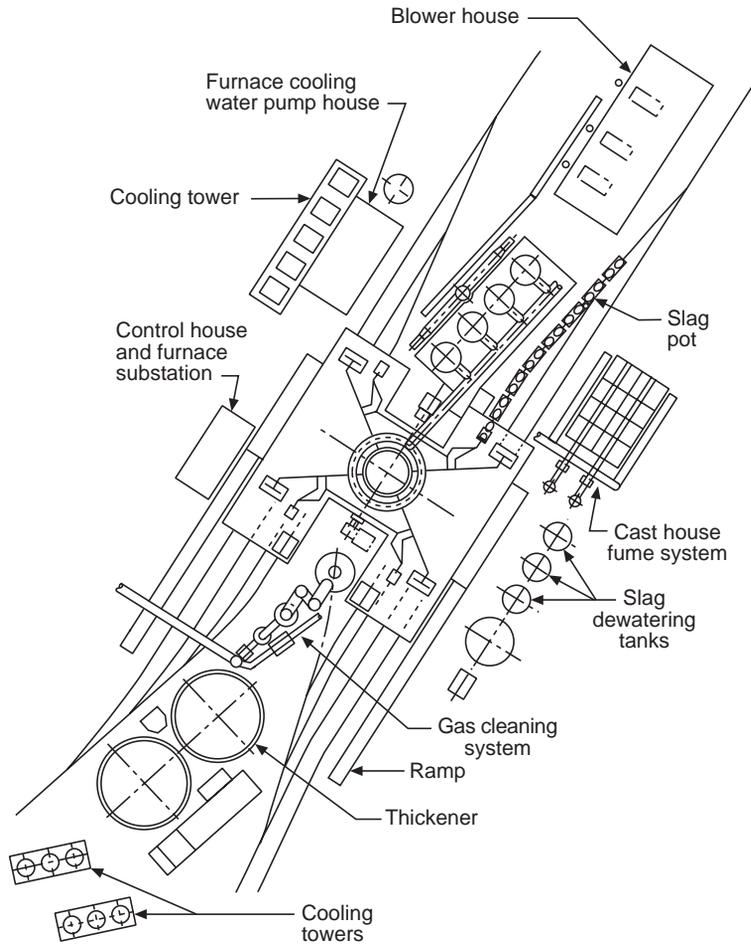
Layout of a casthouse arrangement with four tapholes.
